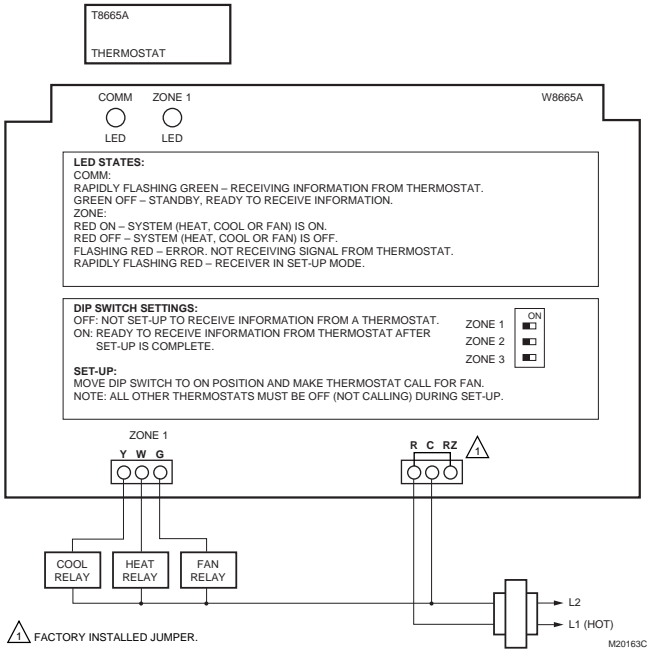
Connecting the W8665A RF Receiver Module to the equipment.
